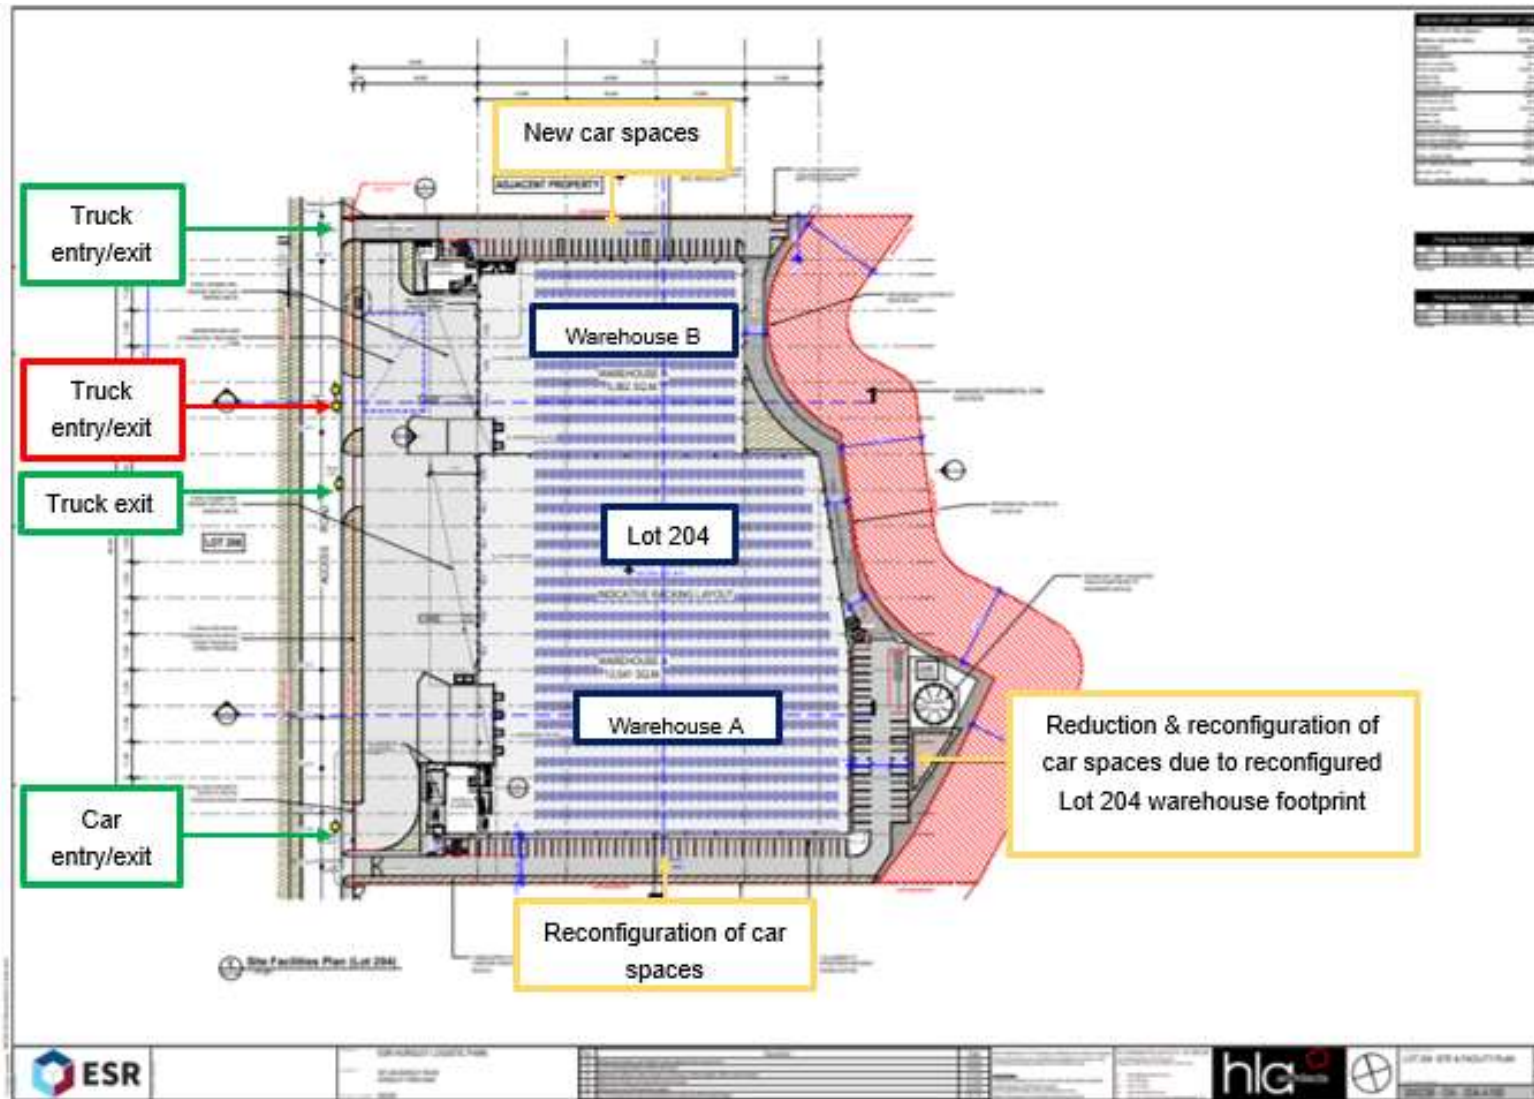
| Proposed Lot 204 Site Plan (new truck entry/exit point identified in red)
